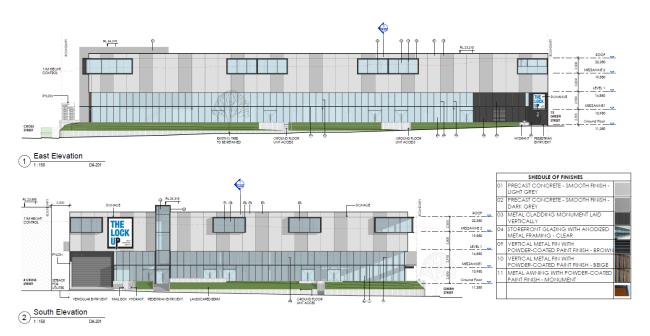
Extract of east elevation, south elevation and schedule of finishes (Source: Pace Architects)
